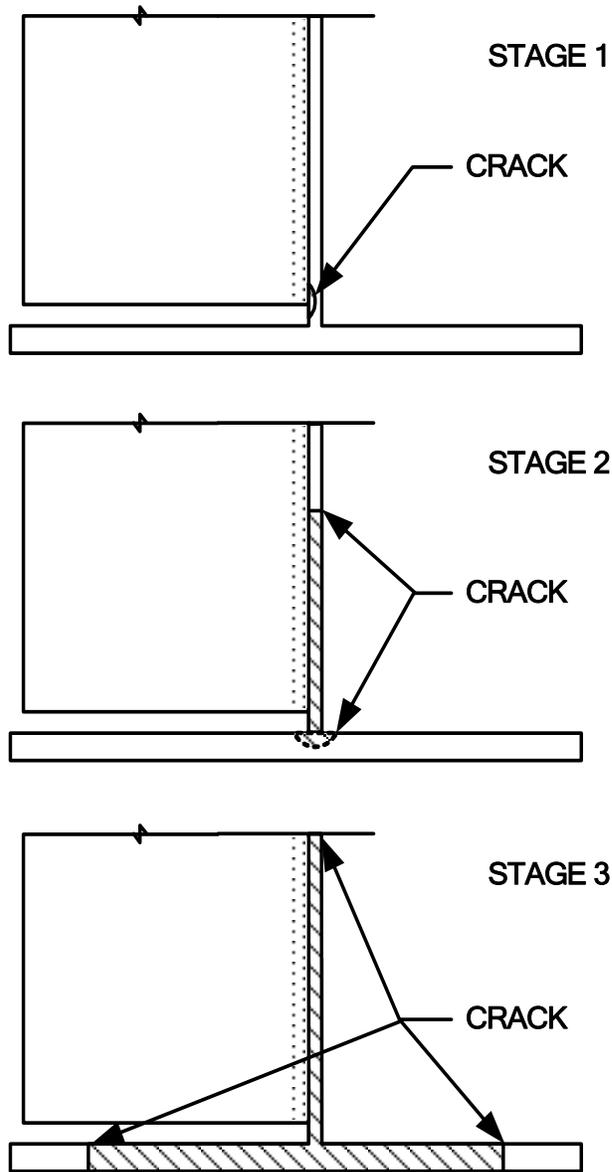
Crack Growth at Transverse Stiffener Welded to Web
